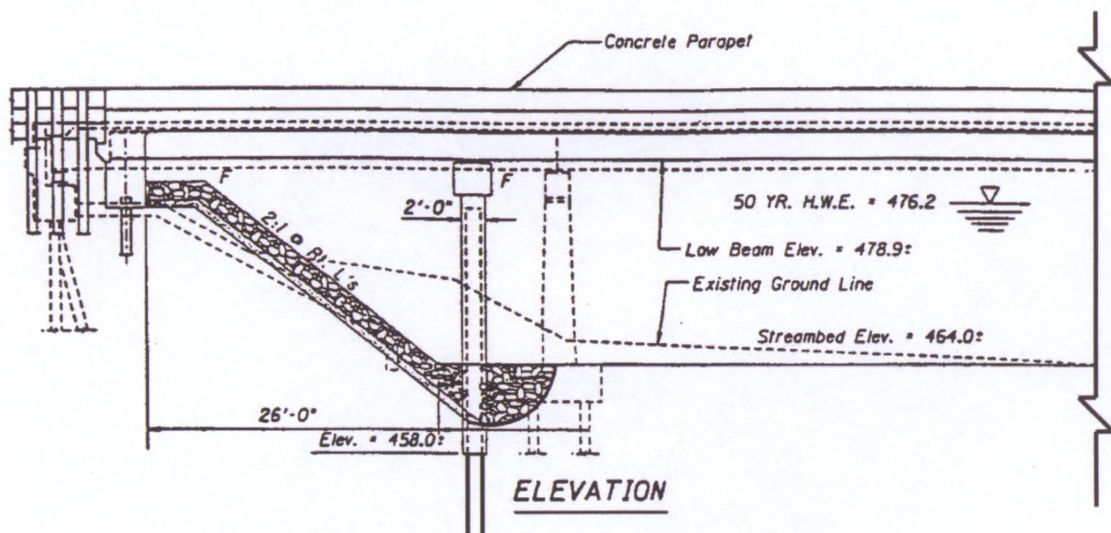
A detail from the construction drawing of a bridge over a small river.
